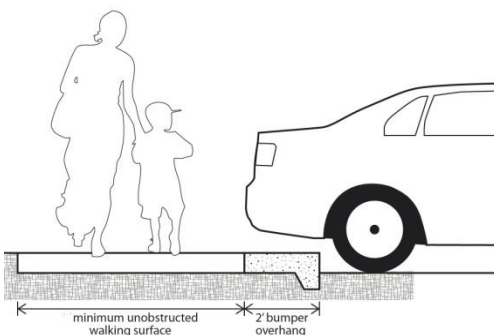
B.3. Concrete extension to accommodate bumper overhang.
